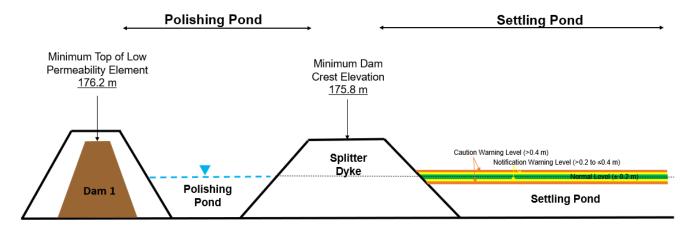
Water and Infrastructure Elevations for Settling Pond / Splitter Dyke (not to scale)
